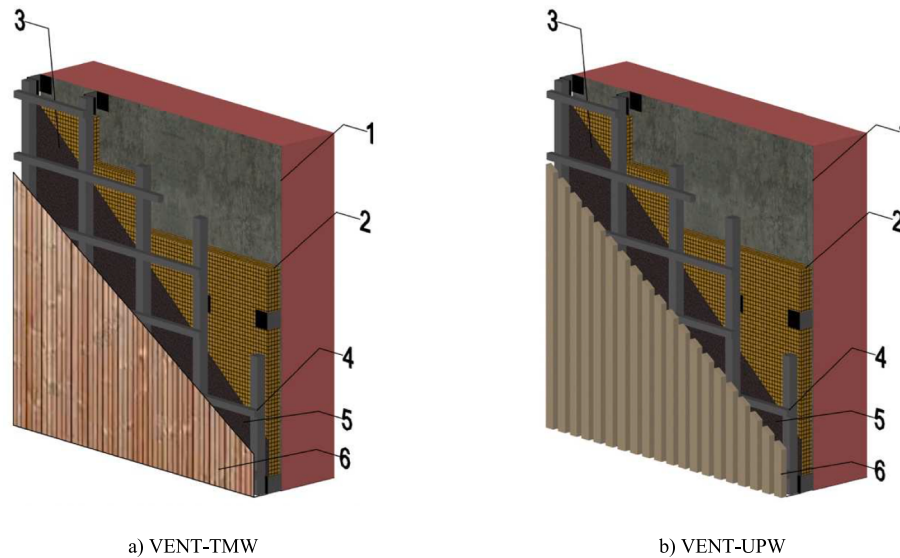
Illustrative example of a ventilated facade system: (1) substrate (wall structure), (2) thermal insulation (MW), (3) waterproofing membrane (4) subframe, (5) ventilated air gap, (6) external cladding.
